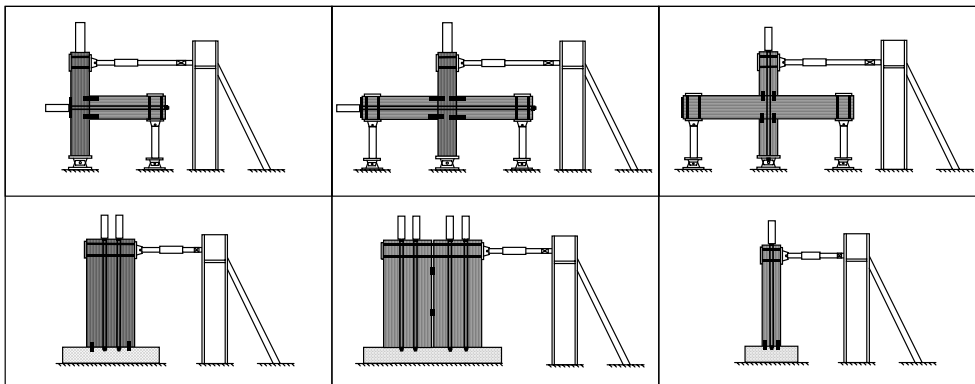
Exterior, interior beam-column subassemblies, single, coupled walls and columns specimens.
